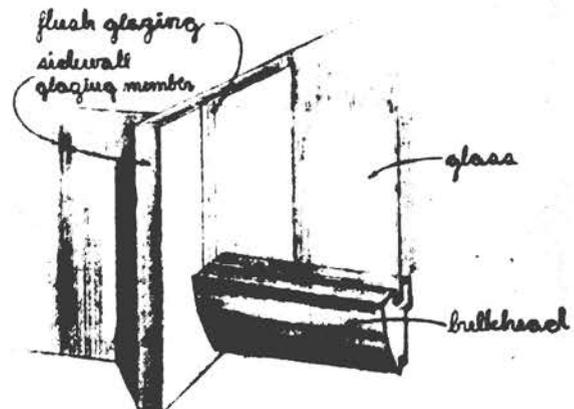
Bulkhead and Sidewall Glazing Member. (Courtesy of Kawneer Co.)
